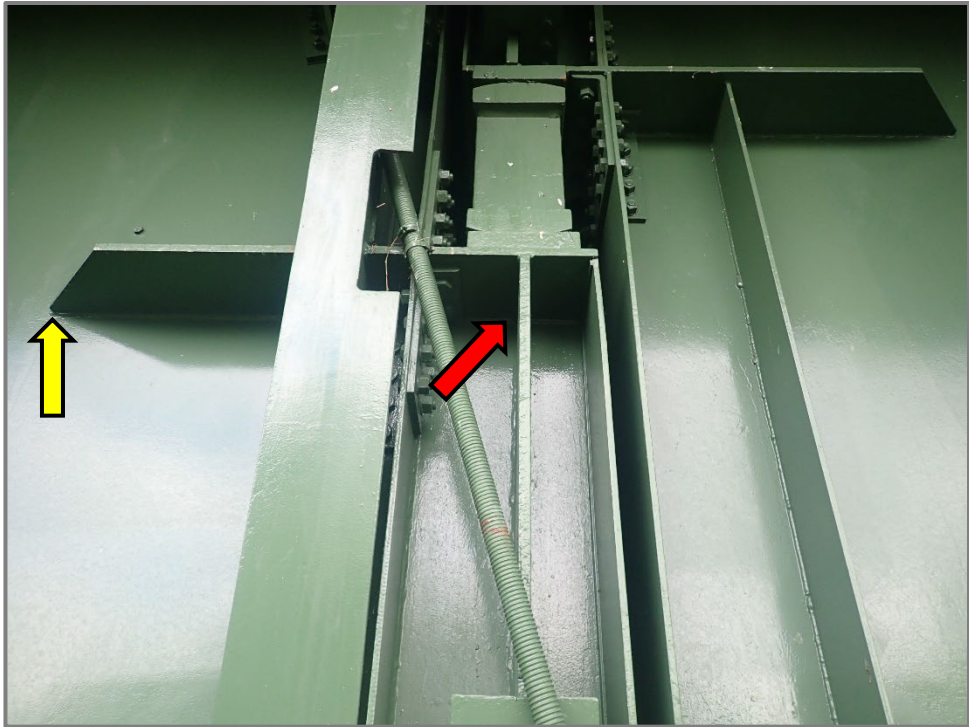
Base metal at the termination of longitudinal seat plates welds to floorbeam webs (thickness > 0.8") (Category E'). Girder A at the Span 4 hinge shown, looking north. Note triaxial constraint below hinge.
